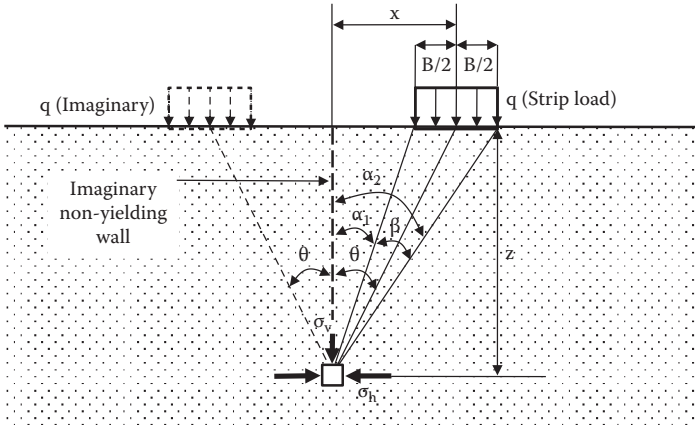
Boussinesq’s lateral stress against a non-yielding wall due to strip load.
